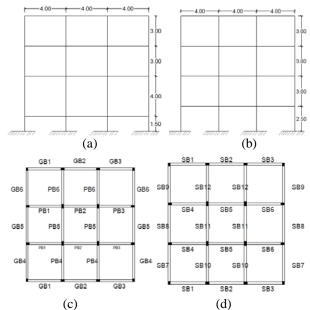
(a) elevation of Frame 1 & 4 (b) Frame 2 & 3 (c) Plan showing Ground beams & plinth beams (d) Plan showing slab beams for first, second and terrace floor
